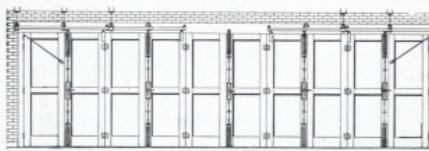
Elevation showing proper location of "Slidelite" ten-door hardware, including No. 617 Cremona Bolts.
